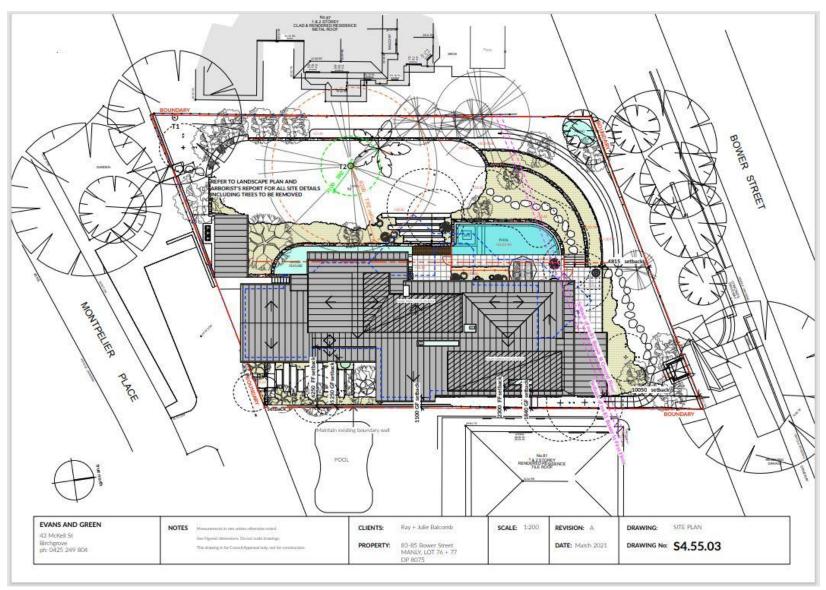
A - Site plan of proposed amended dwelling house, dashed blue outline indicates current dwelling (see final architectural plans from Evans & Green 2021)
